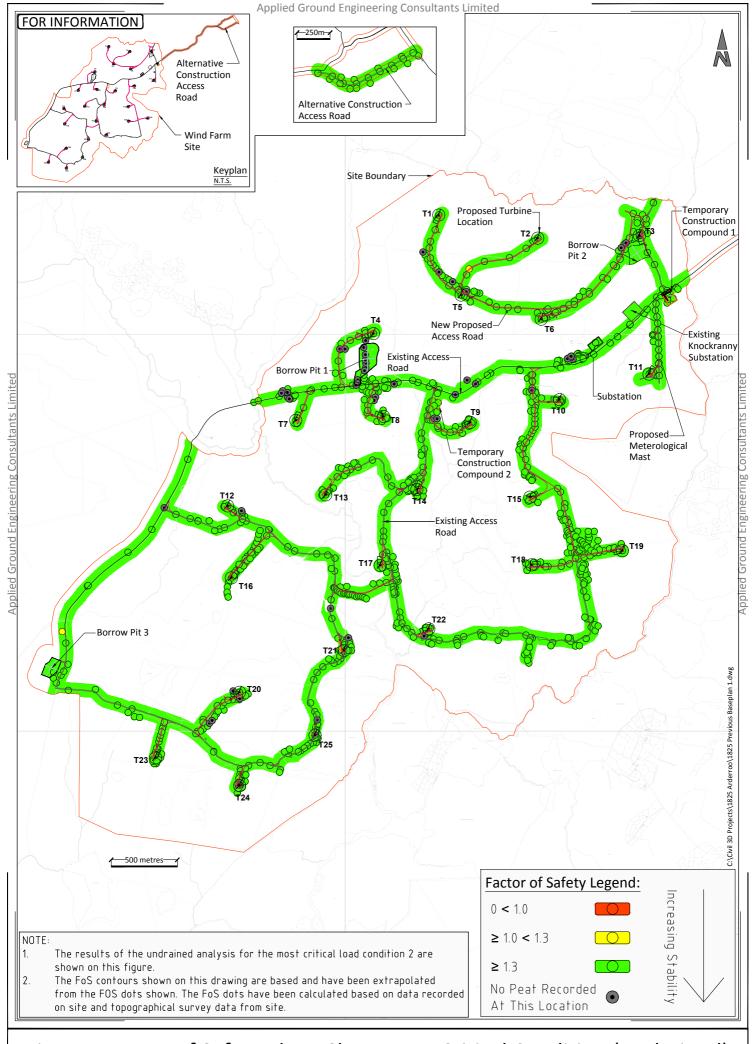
Factor of Safety Plan - Short Term Critical Condition (Undrained)
